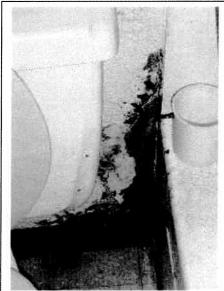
Bathroom - The wallboard between the tub and the toilet is a common site of deterioration.
